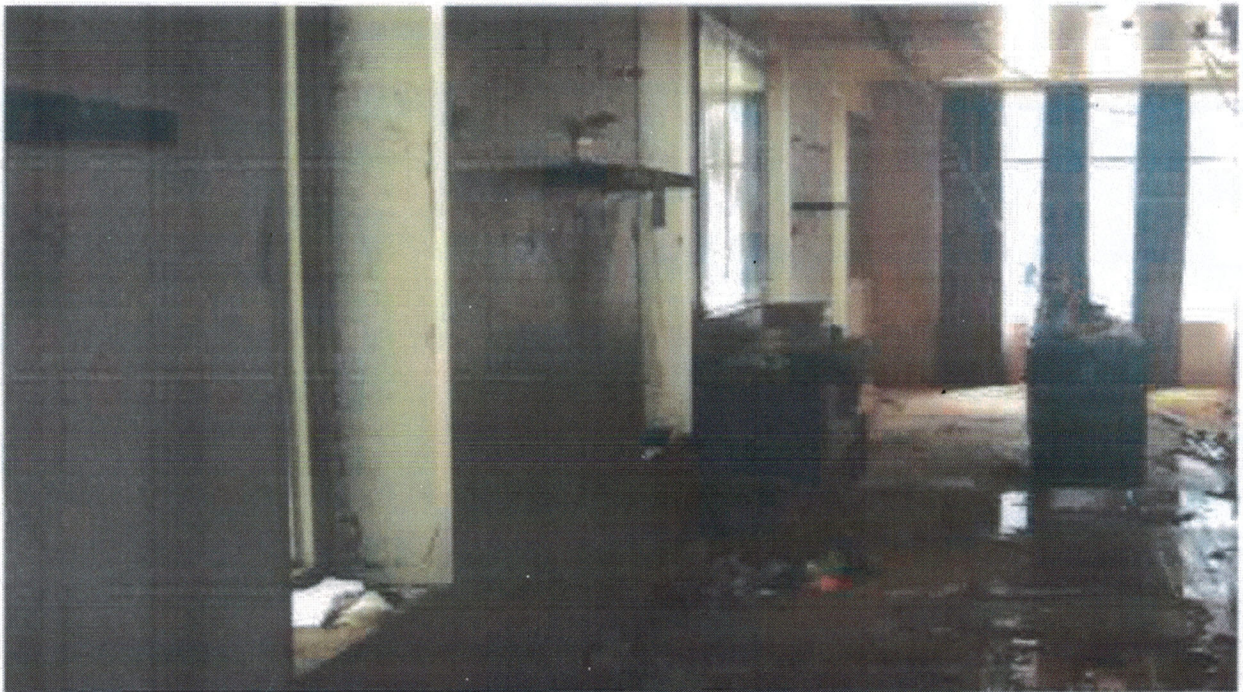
Ground floor water damage to floors walls and ceiling. Mildew and mold growing on the walls.
